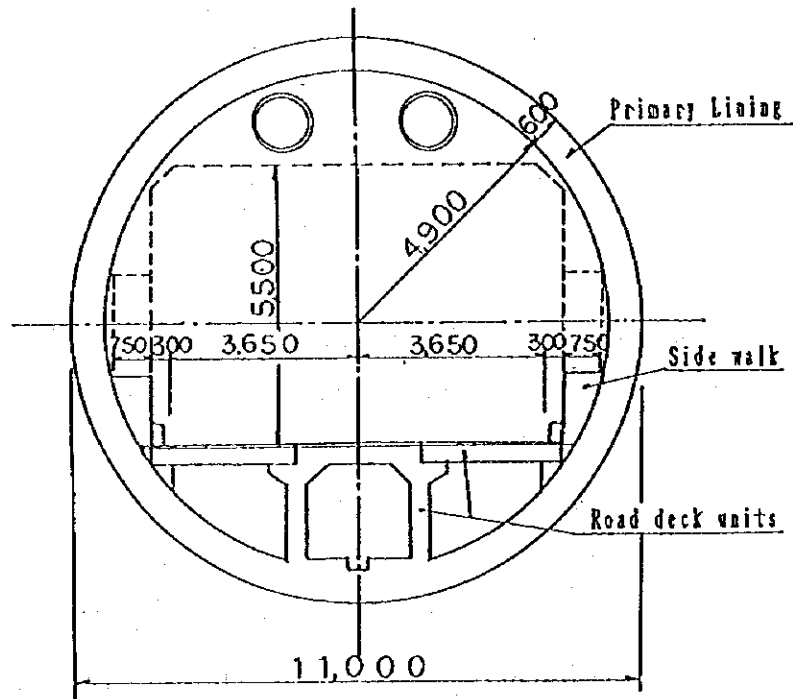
Tunnel Section Showing Primary Lining only
